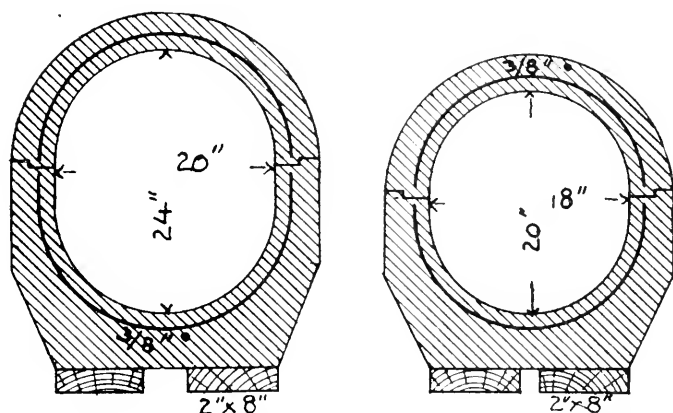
CITY OF CAMBRIDGE. CONCRETE SEWER SECTIONS
